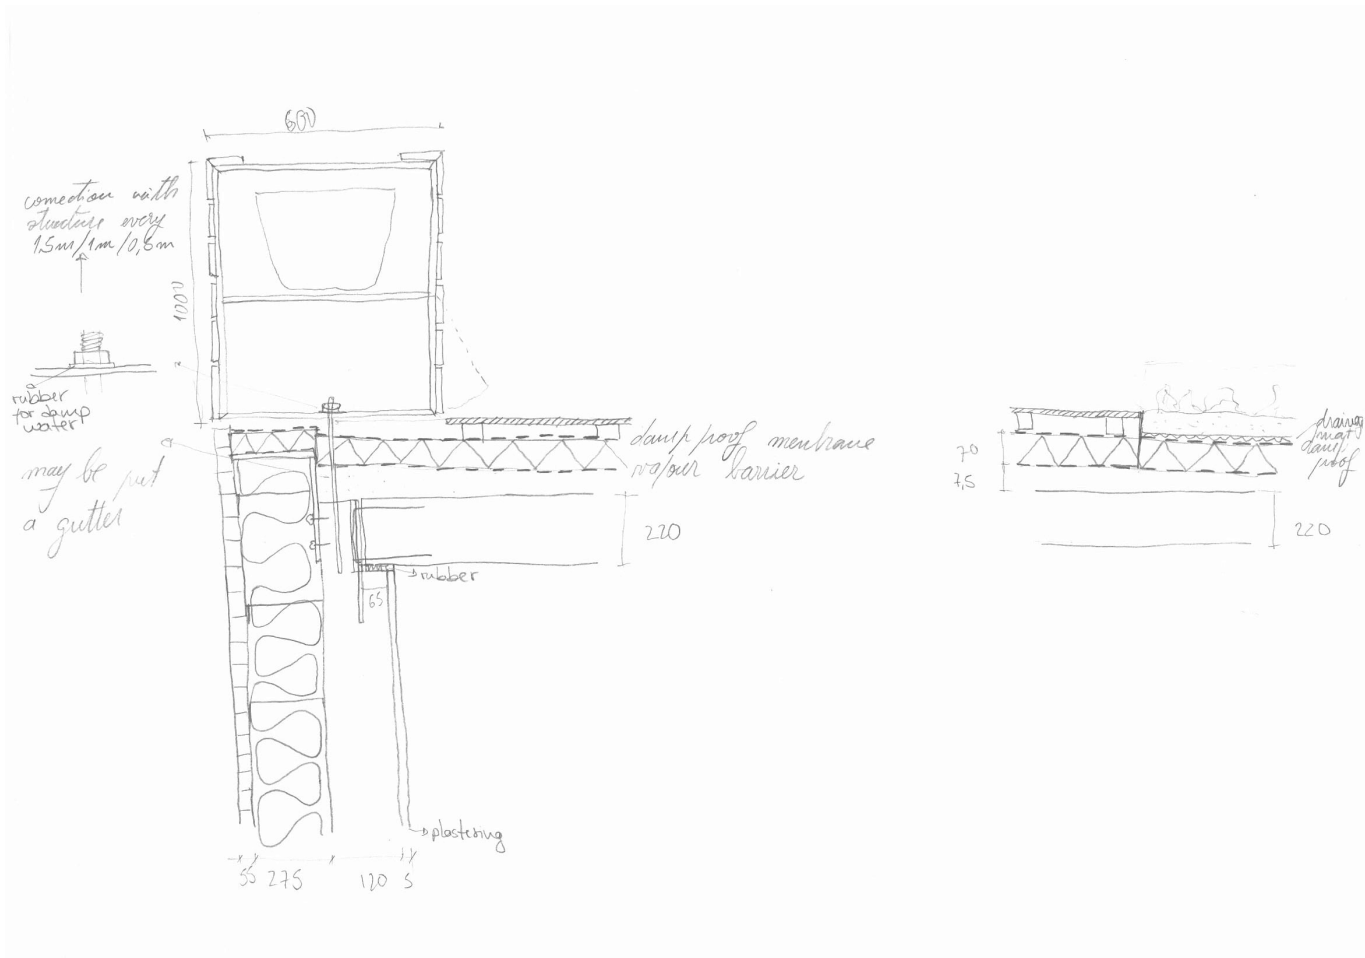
Sketch: railing protection, structure and its connection to the slab and the wall. It also shows the different types of flooring in the terraces
